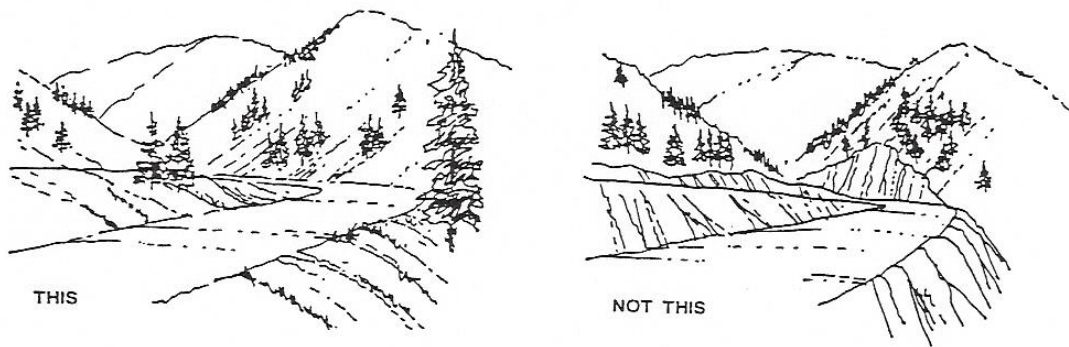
Driveway design should minimize the need for cuts and fills.
